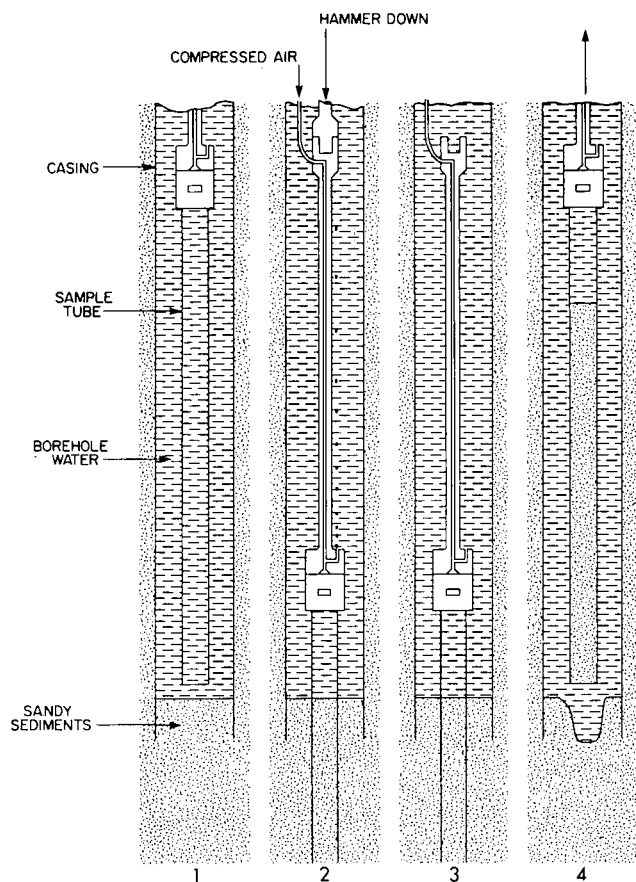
Operation of cohesionless sediment sampler. 1 - Sampler being lowered. 2 - Sampler driven beyond end of casing. Air pumped in to close valve above sample. 3 - Driving rods removed. 4 - Sample tube withdrawn and being lifted to surface.
